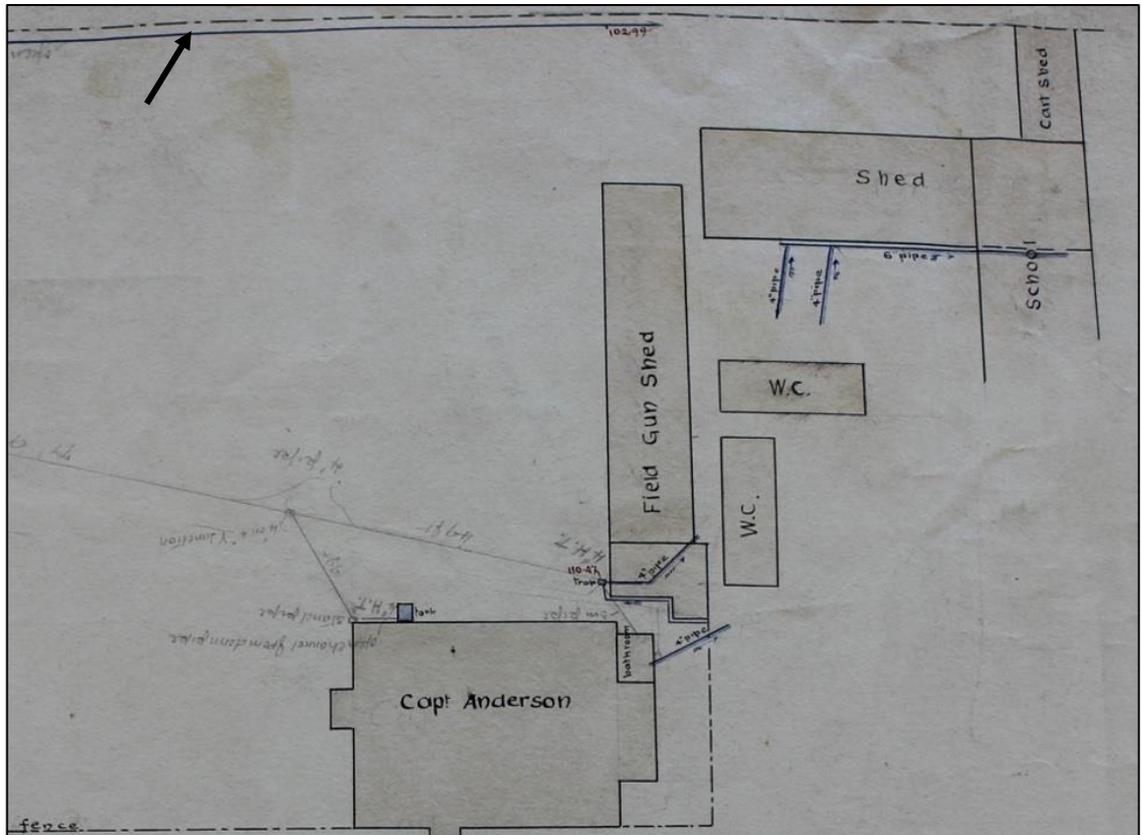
Detail from 1893 Public Works Plan illustrating the open drain running along the northern boundary of Town Acre 233 (arrowed) and extending toward the northern excavation area
